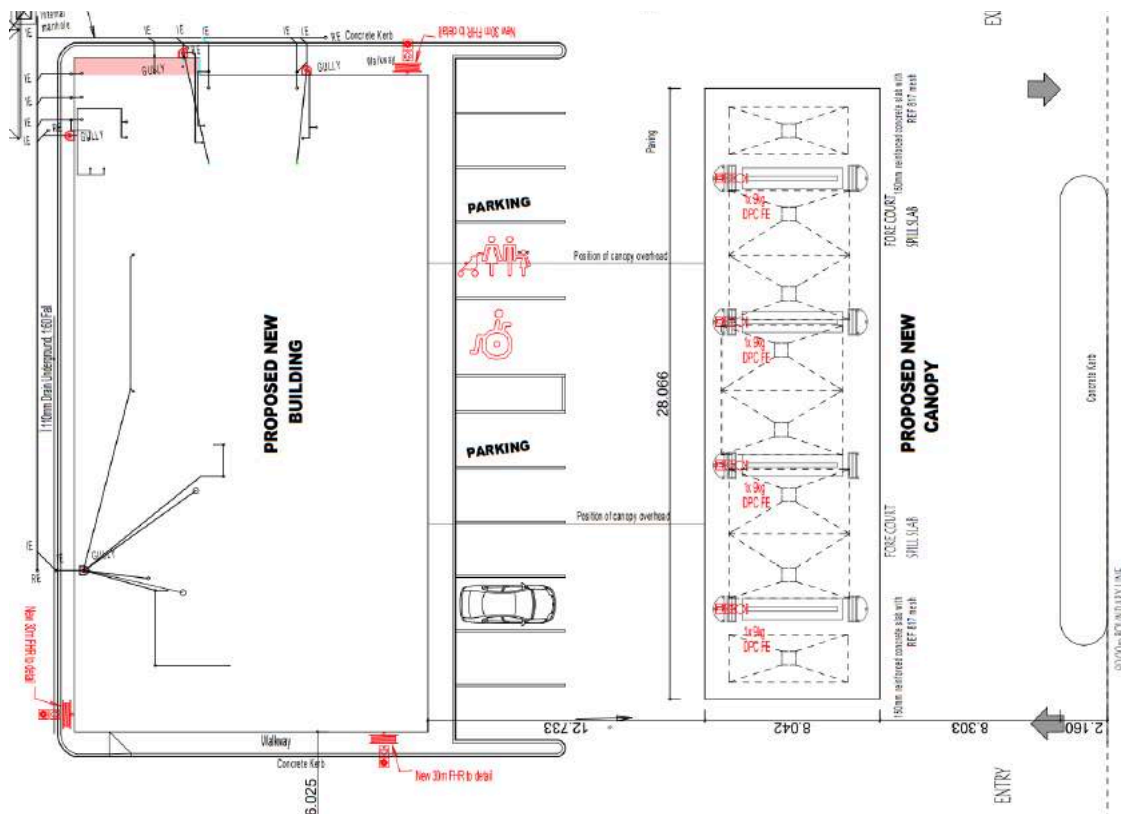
Proposed layout plan for development (Source: Abisai Konstantinus, 2021)
